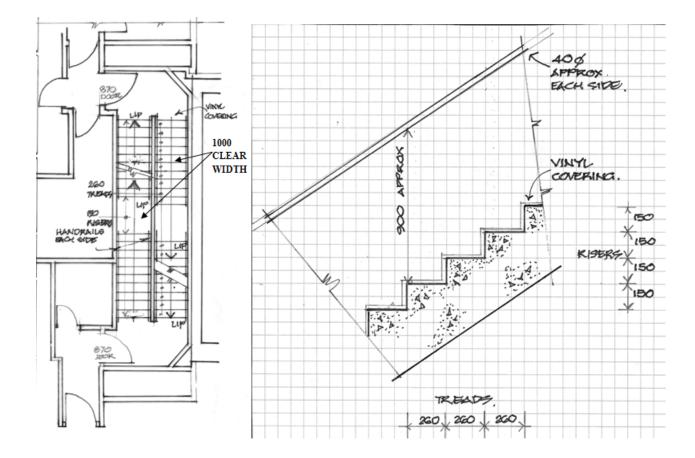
Diagrammatic Plan of Scissor Stairs and Part Section
